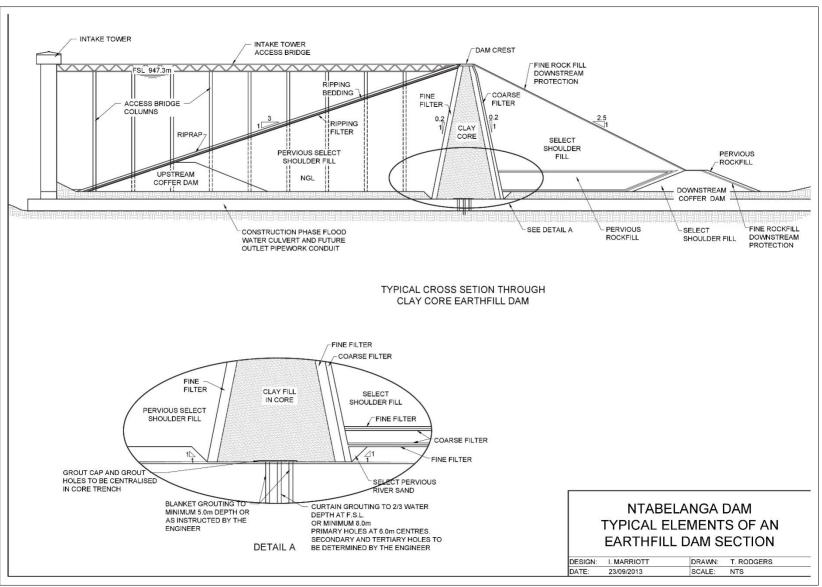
Typical Sections and Details for EC Earth fill Type Dam
